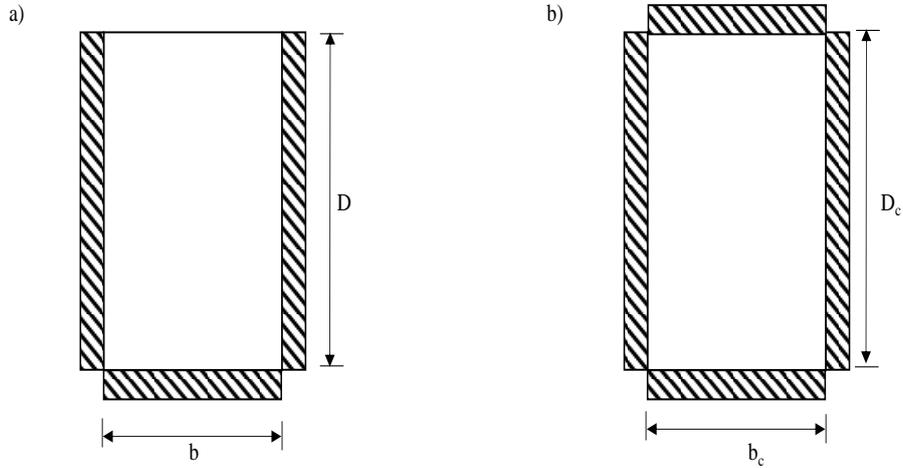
Formwork profile for member cross section: a) Beam b) Column
